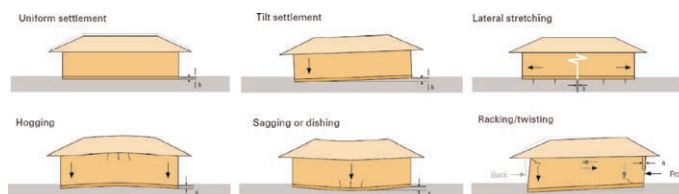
Typical damage patterns for house foundations, after (Department of Building and Housing 2011).
